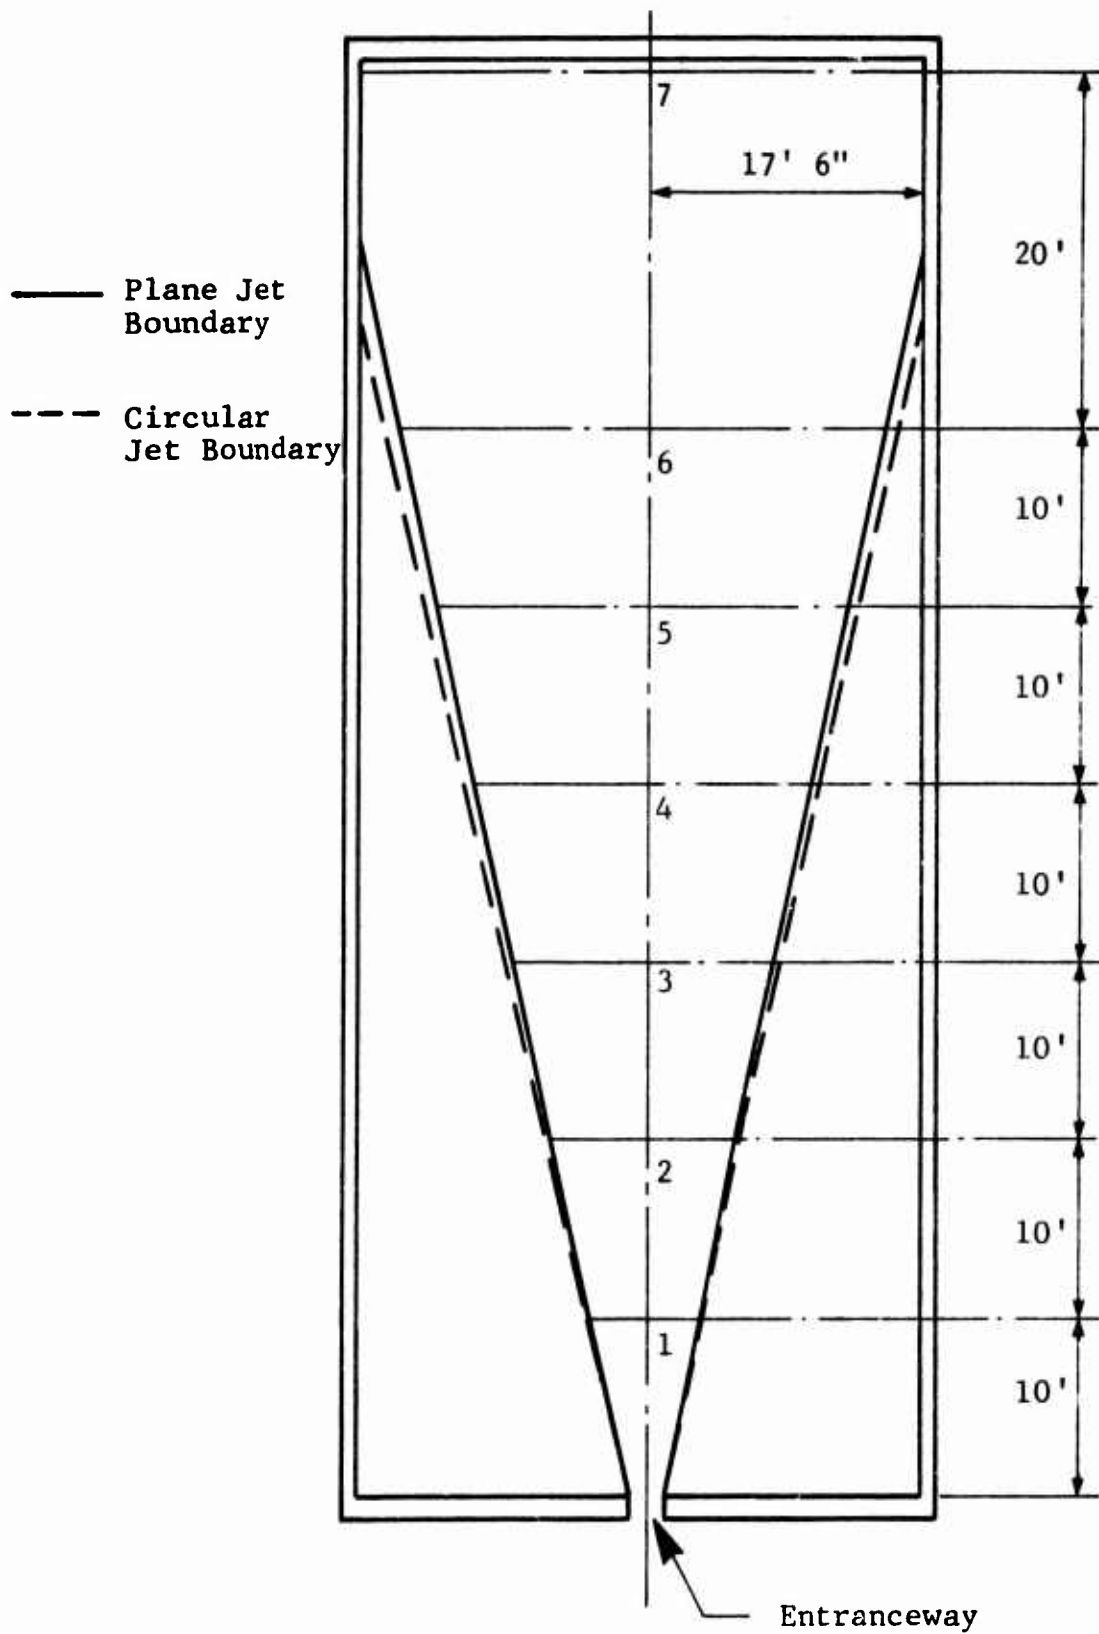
ARCH SHELTER PLAN SHOWING JET BOUNDARIES (Ref. 14)
